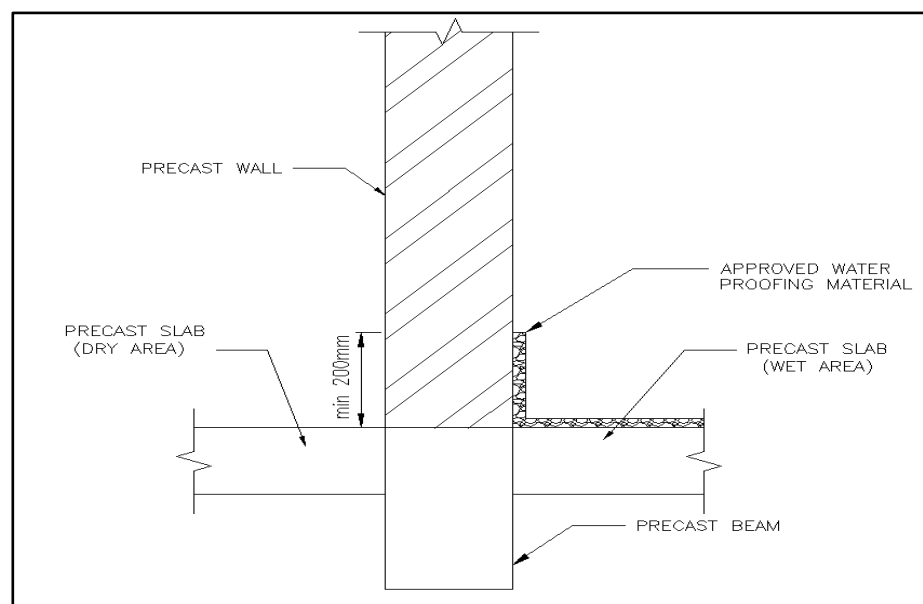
Typical Installation of Waterproofing Material on Wet Area
